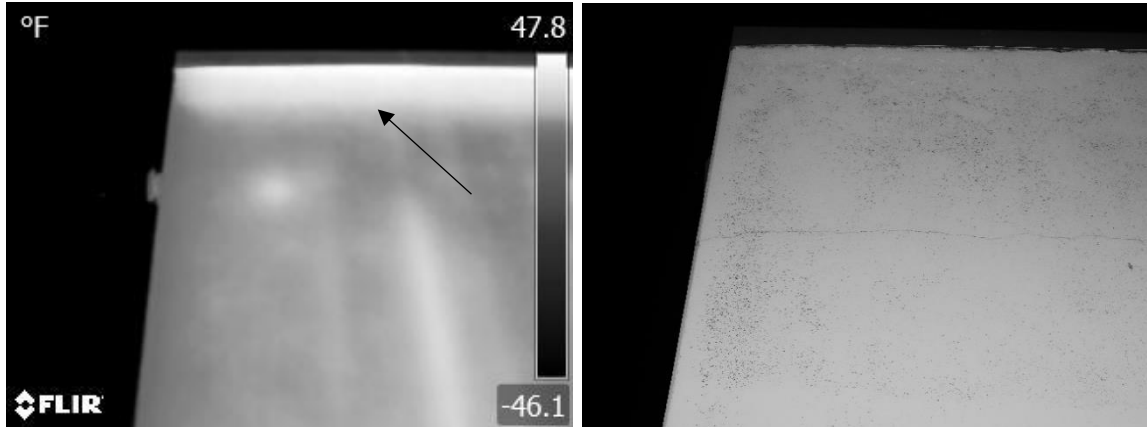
SWP structure with thermal bridging at roof termination: thermal image (left) and visual image (right)
